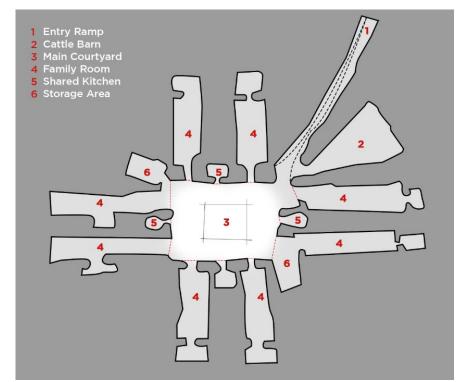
Plan of an underground house in Ghryan (Adapted by author, 2021 from Elwerfalli, 2016)
